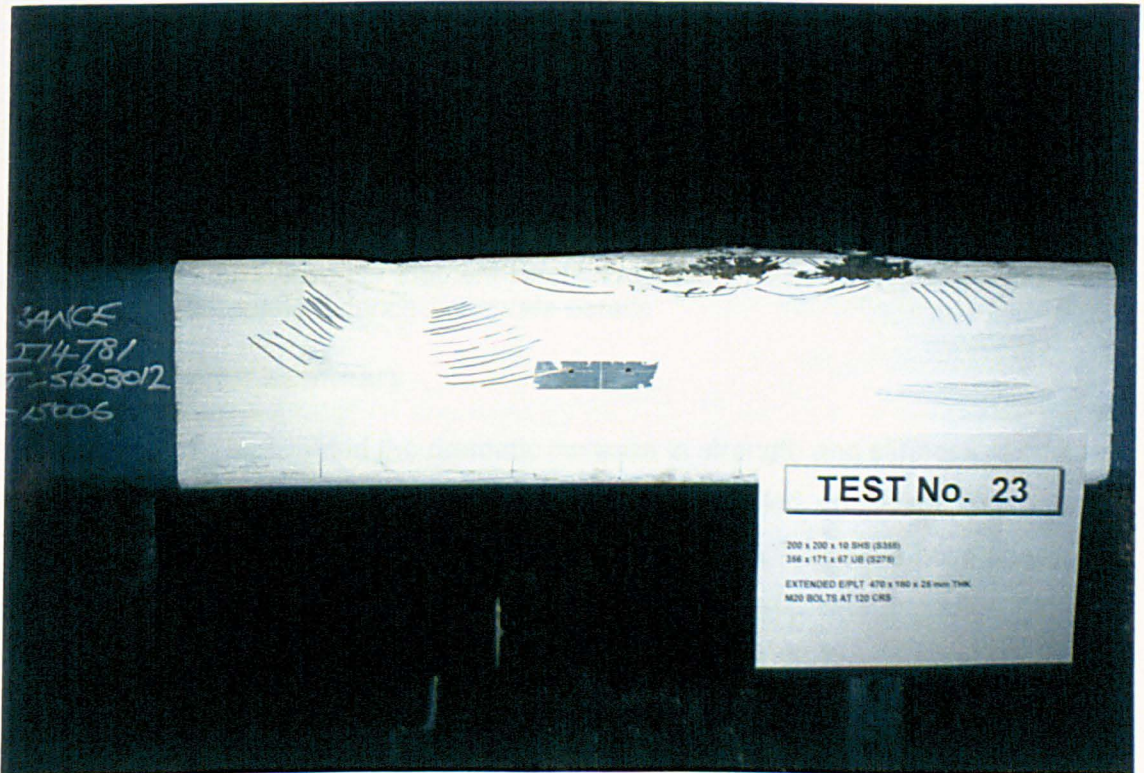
Joint test no. 23 after failure- Unfilled column section
